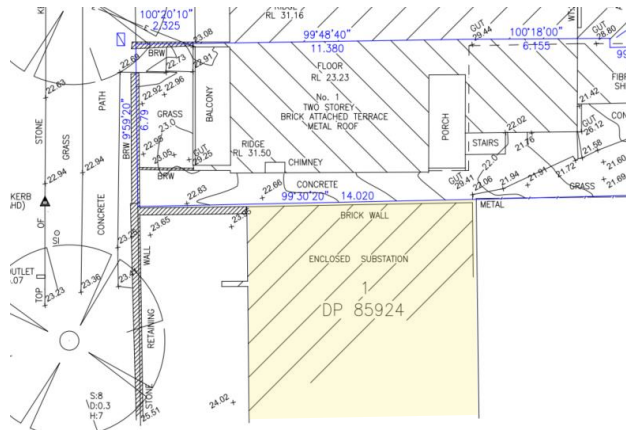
Extract of 1 Gale Street Survey Plan showing location of existing substation (Source: Vertex Surveyors)
